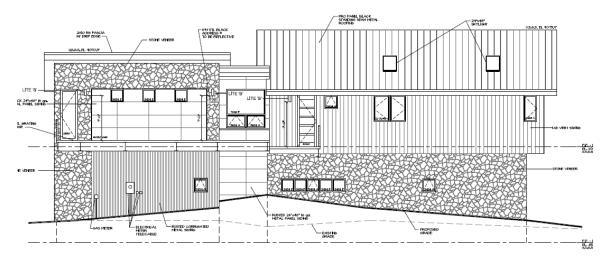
Proposed Structure South Elevation (multiple roof forms)
